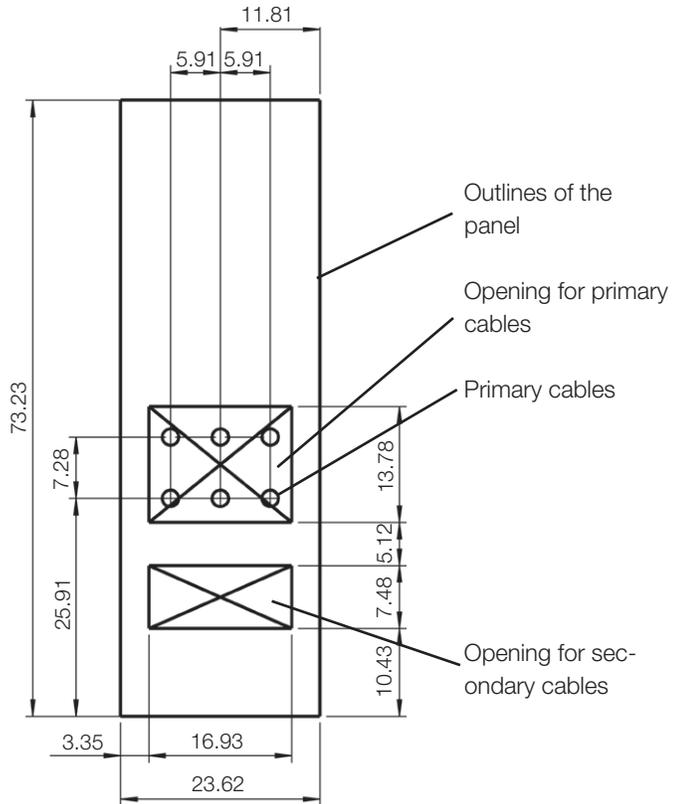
Feeder Panel with block-type CT, panel width 31.50 in, dimensions in inches
